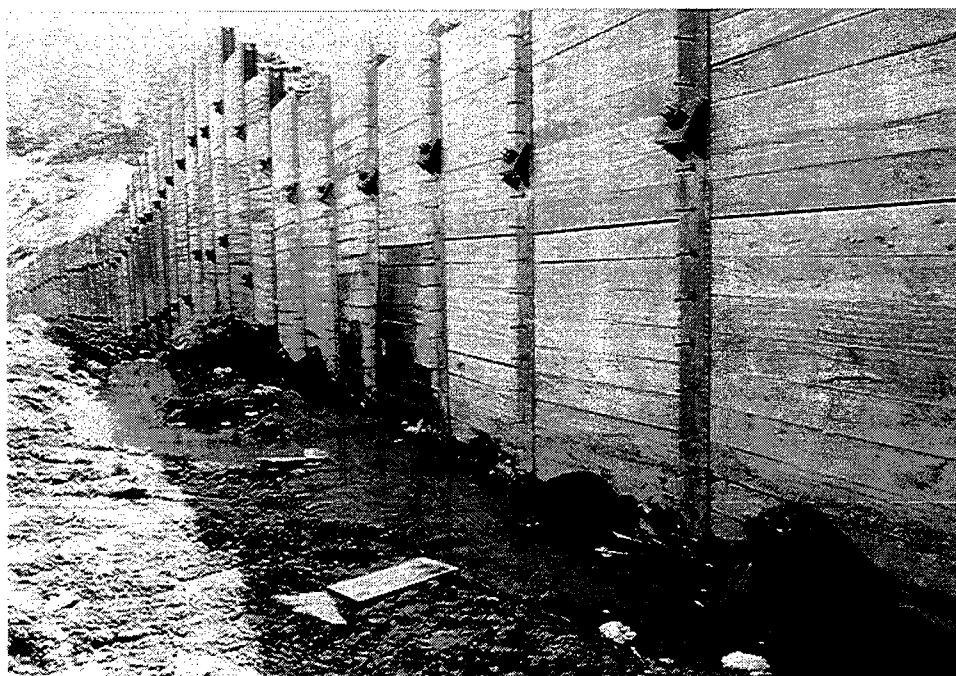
This Tie-Back Wall Located Near Sams Gap Illustrates the Soldier Pile and Wood Lagging Concept with the Actual Tie-Back Anchors Protruding from the Soldier Piles.
